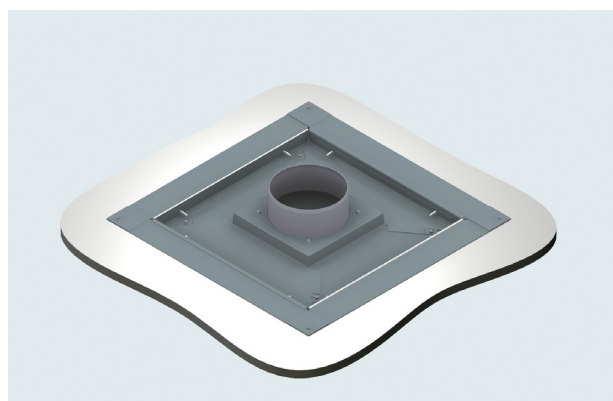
Opticlean with gypsum plasterboard ceiling mounting frame
